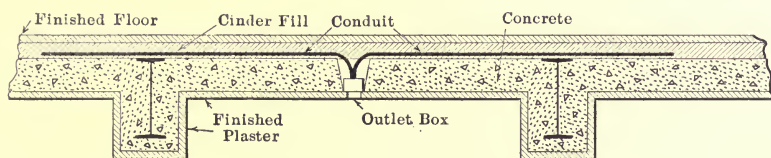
METHOD OF INSTALLING CONDUIT IN CONCRETE FLOOR.
